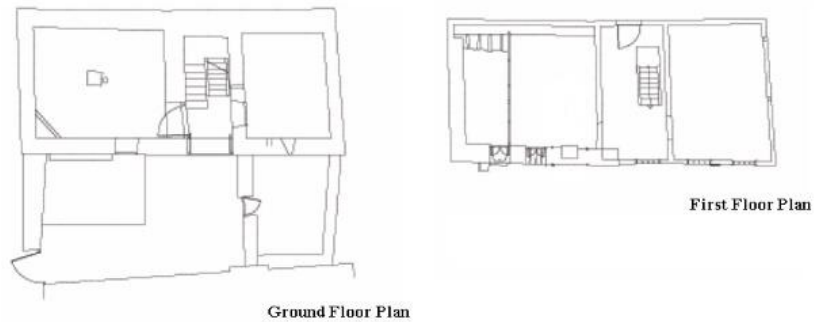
A typical plan of a traditional Şirince house with a courtyard (Uyar, 2004)
